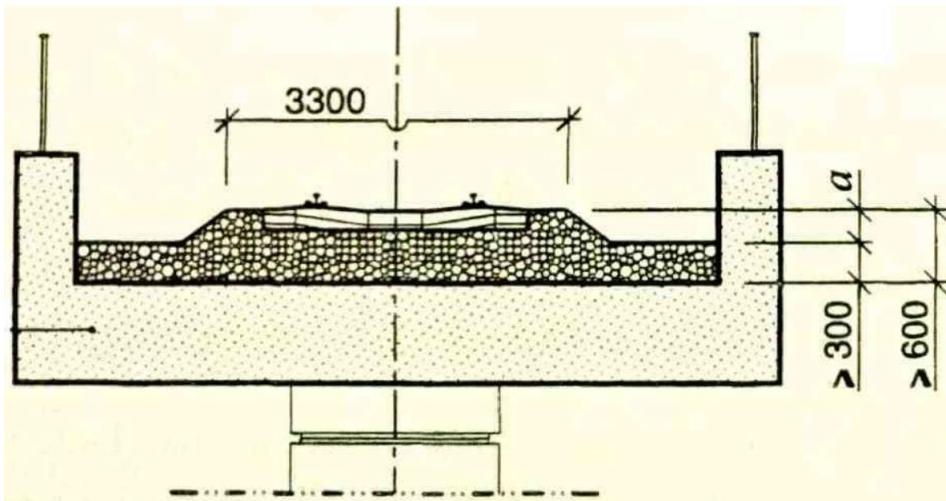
Ballasted track structure on a concrete bridge, (Sundqvist & Sahlin, 2000).
